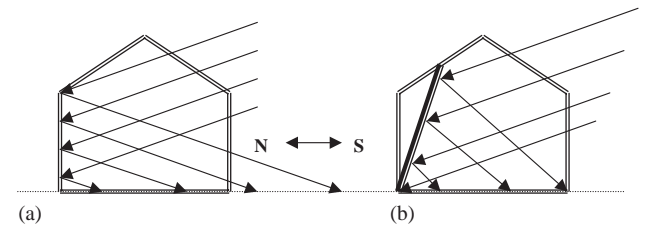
Even span greenhouse with vertical (a) and inclined (b) reflecting wall.
